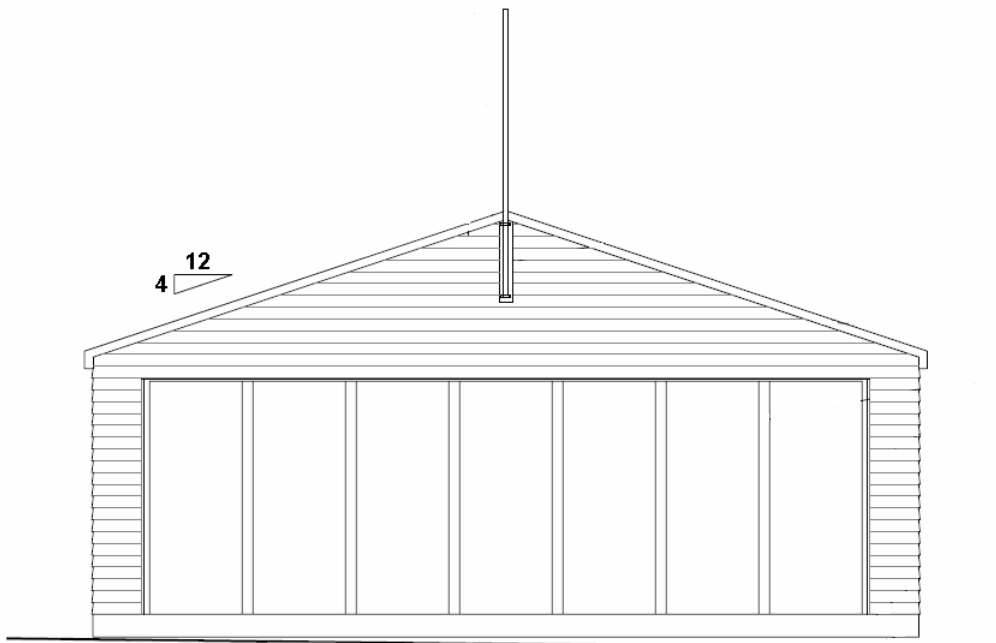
Coquitlam test hut: East elevation (West similar)
